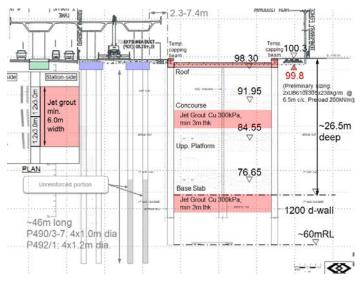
Pre-installed struts for station box excavation next to expressway viaducts
